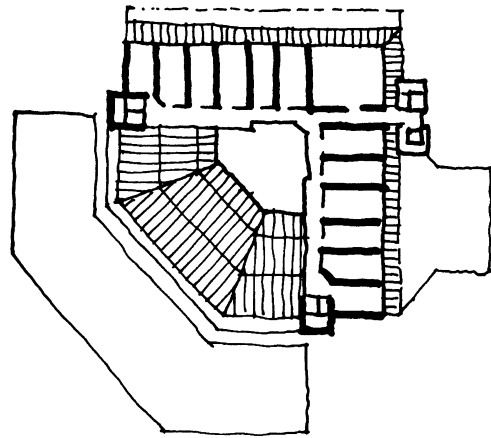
History Faculty, Cambridge, 1968, Fifth floor plan*. From *Architectural Review*, 11/68, p. 337.
